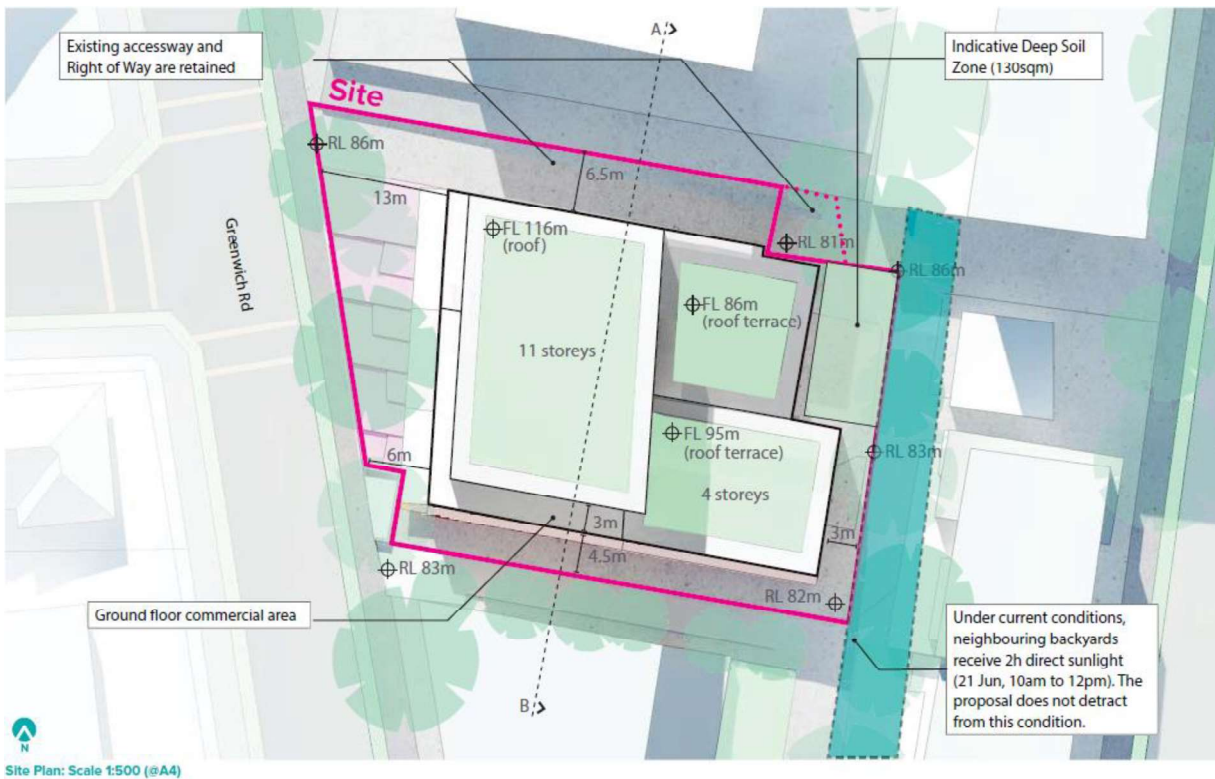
Site plan of proposed concept design (source: Roberts Day)
